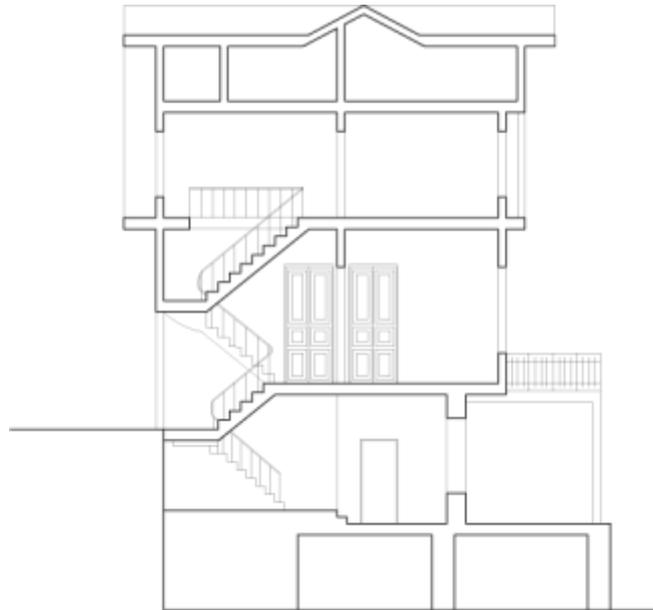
BB' section of the house at 149 lot 2 parcel
